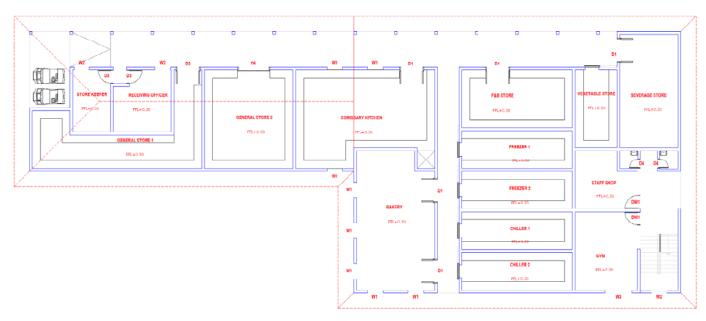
Kitchen stores and Staff Facilities- Ground Floor
